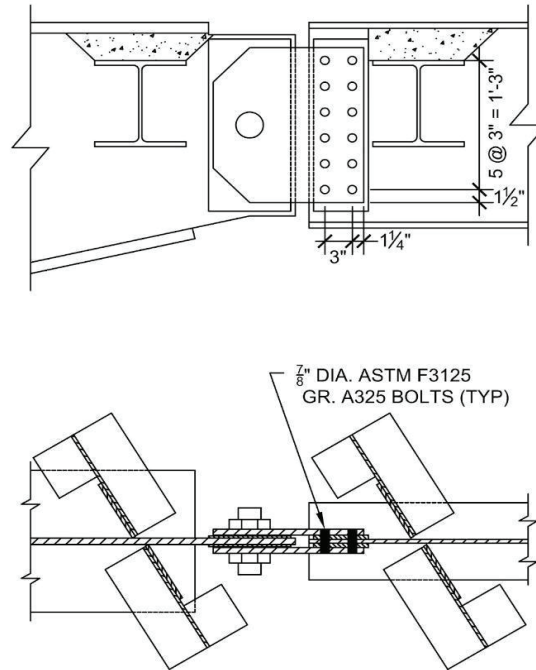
Bolted retrofit to address pack rust between pin plates of a girder hinge connection, similar to the condition shown in Figure 3-48
